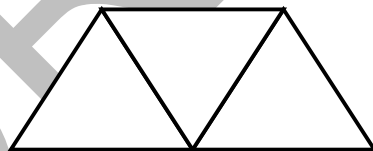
A simple Warren truss is made up of equilateral triangles.
